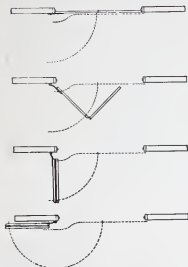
Floor plans showing operation of two doors equipped with "Slidetite" No. 1235 hardware illustrating (1) doors in closed position, (2) doors partly open, (3) doors open at right angles with front wall, (4) doors open parallel with front wall. The dotted lines represent the tracks.
